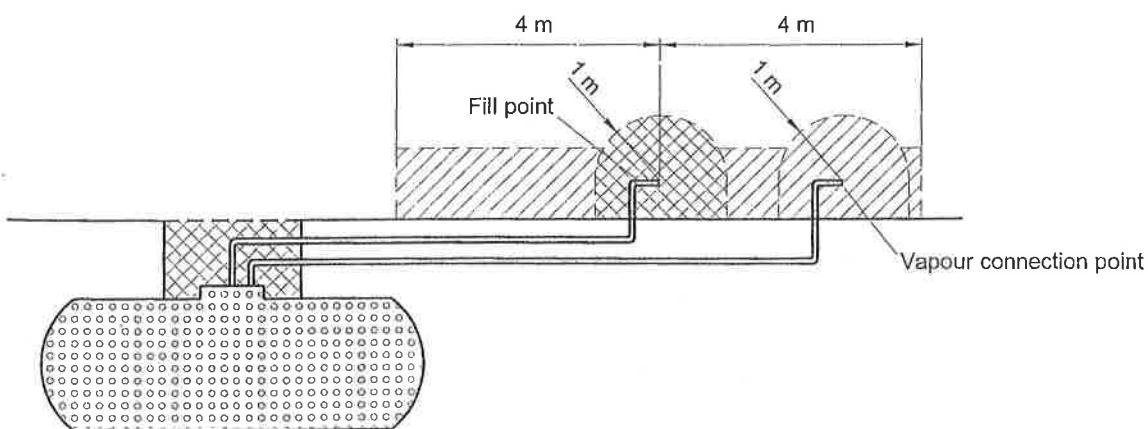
Typical hazardous area classification for underground gasoline storage tanks and fill points during road tanker connection, unloading and disconnection
